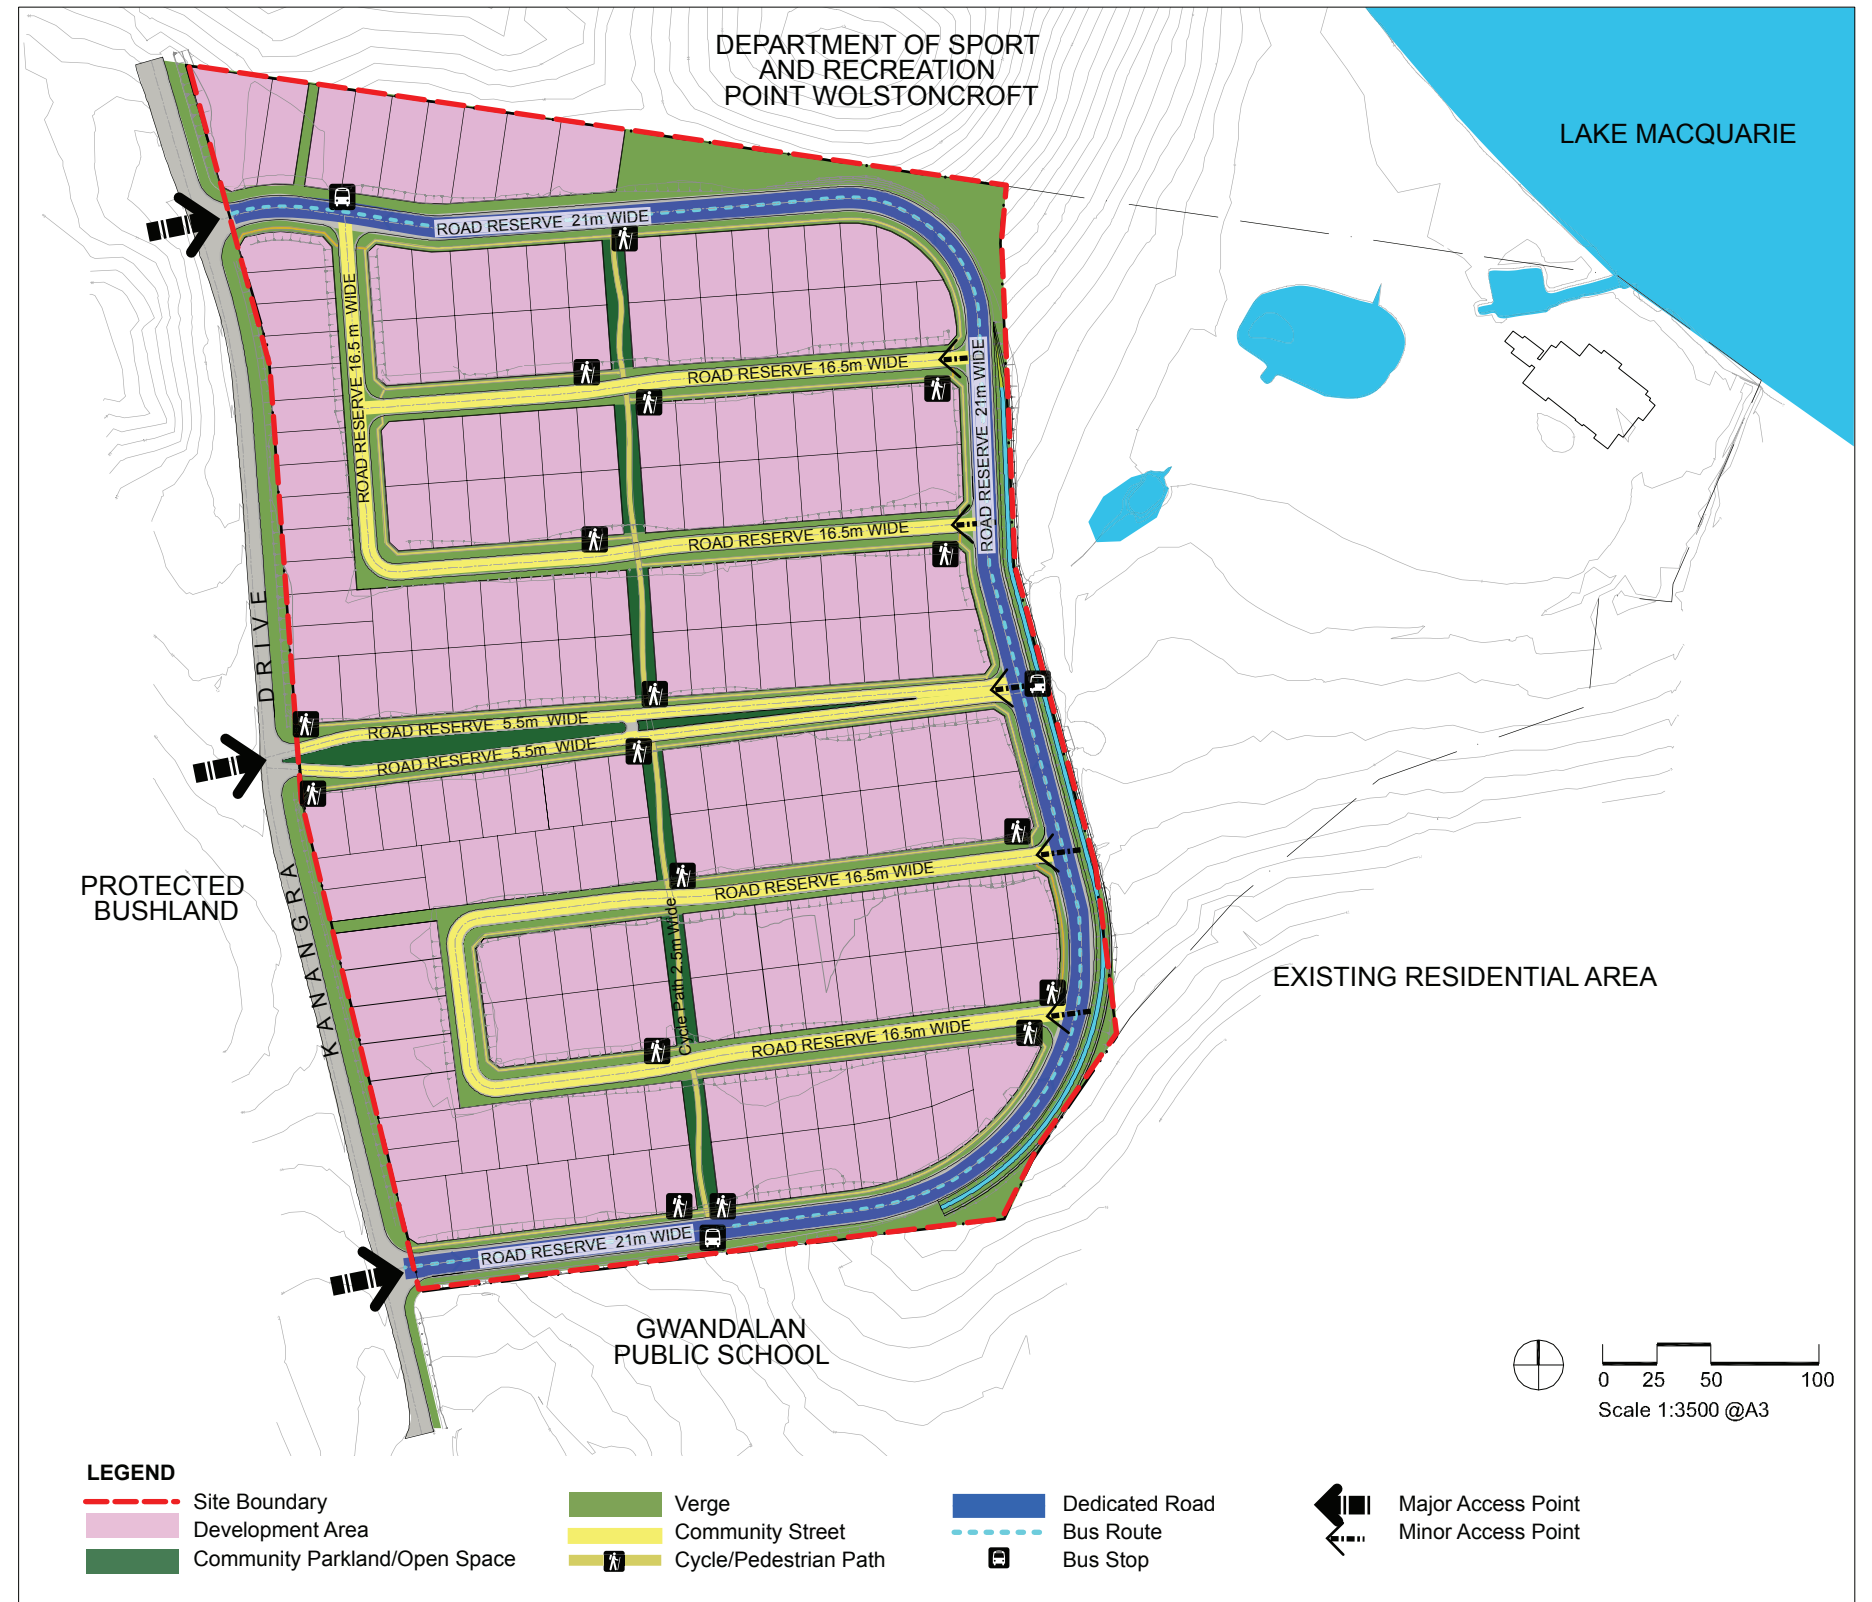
Gwandalan Access, Parking and Circulation Plan.
